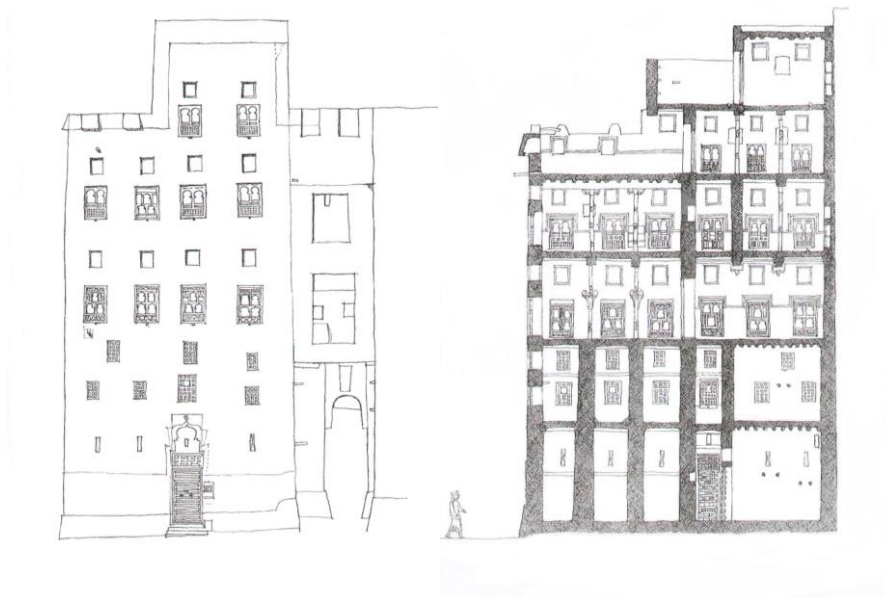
The art of the Tower House: Section and elevation of house B 37, Shibam
